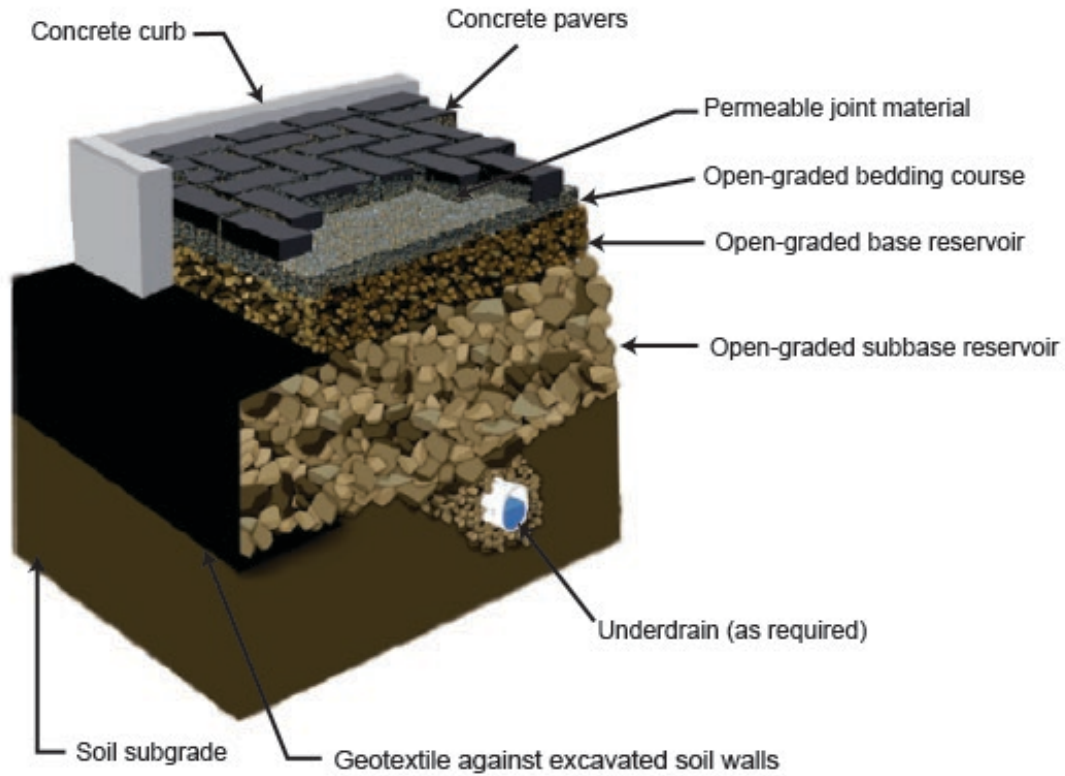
Typical cross section of an interlocking paver system (UNHSC 2009).
